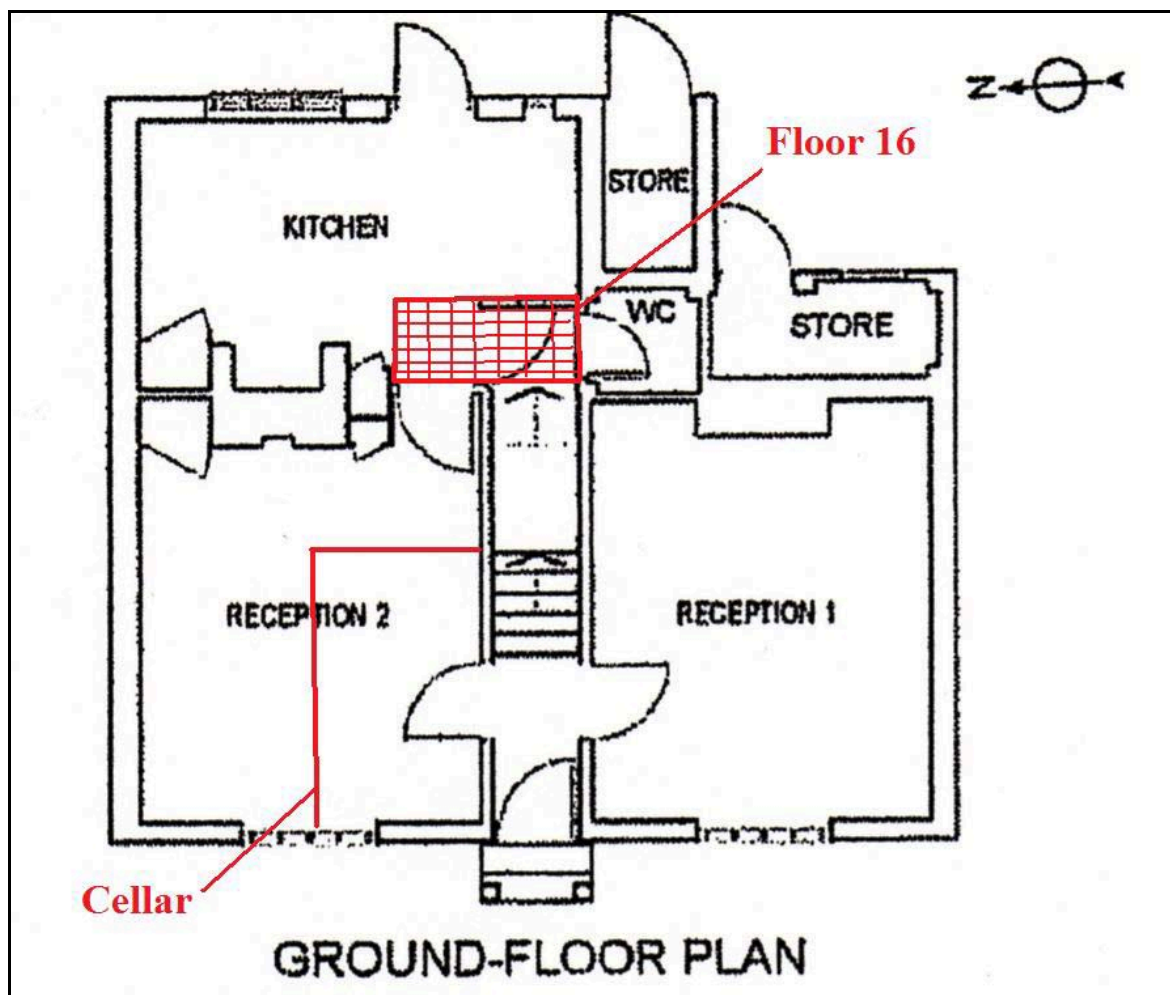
Seymour House, Rye: Ground plan of Seymour House,
